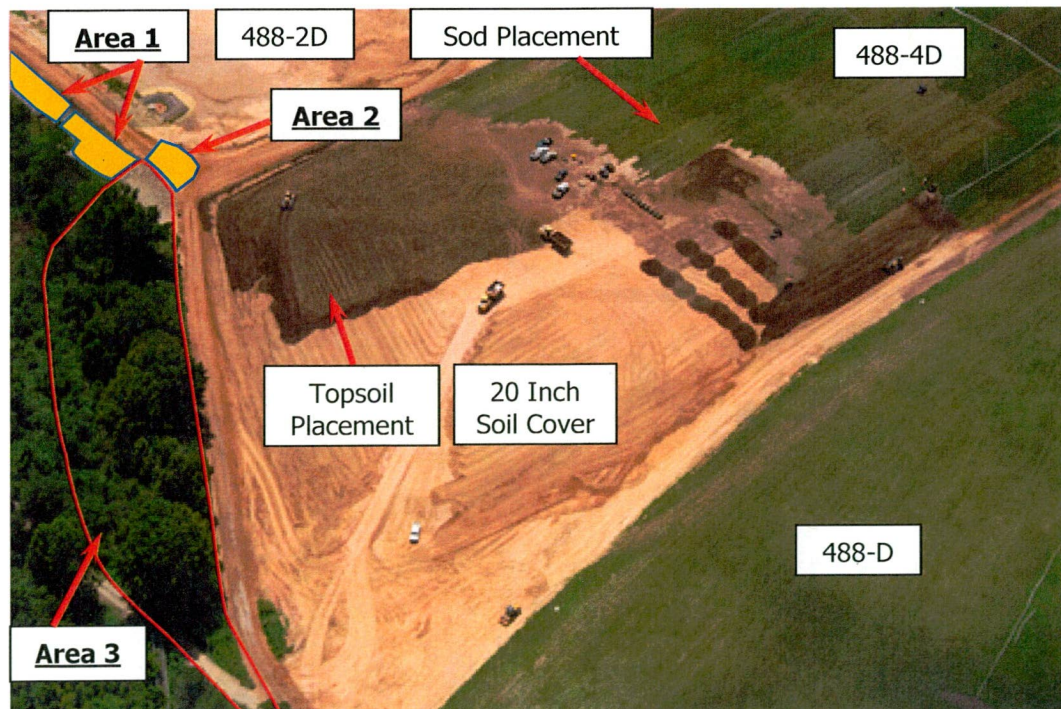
488-4D Topsoil and Sod Placement Ongoing
